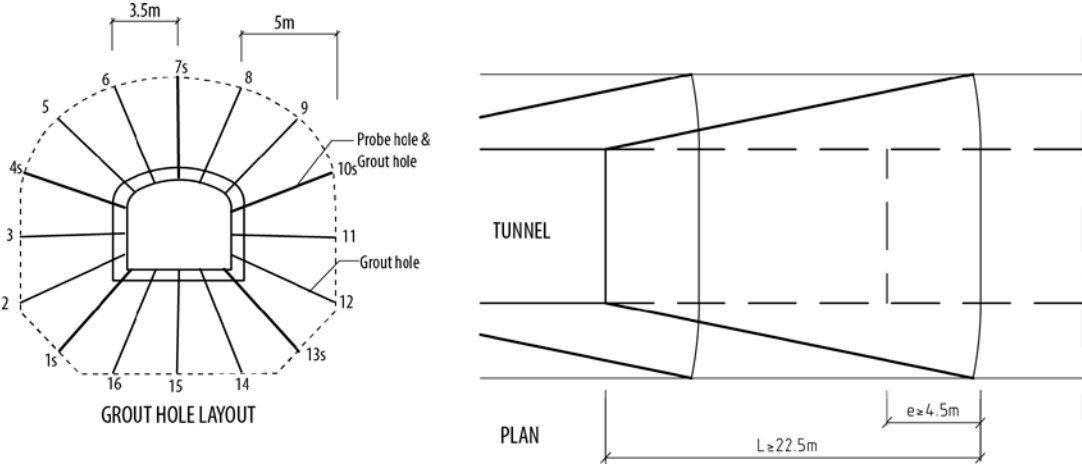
Layout of the probe holes and grout holes used for the grouting operation, section and plan view.
